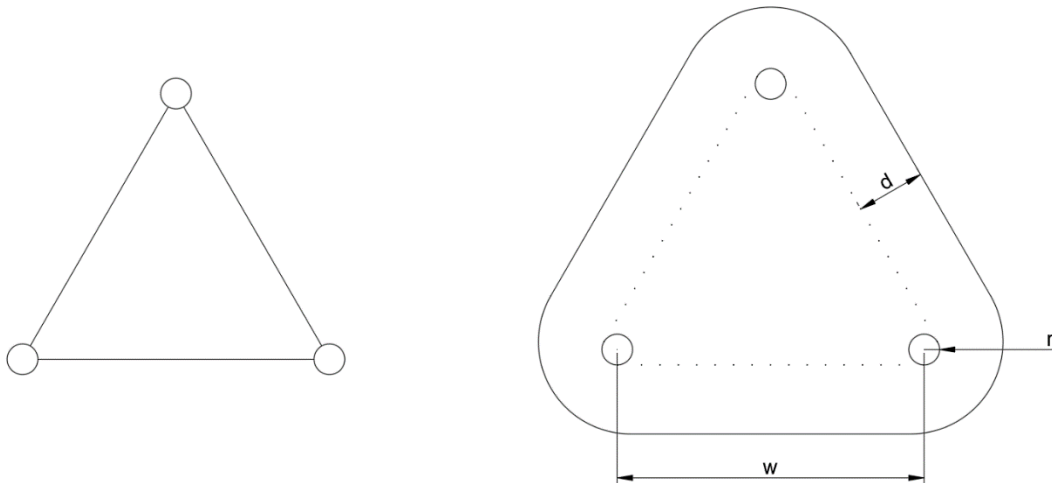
Hinged longitudinal elements as modelled on the left, proposed connection sheet on the right
